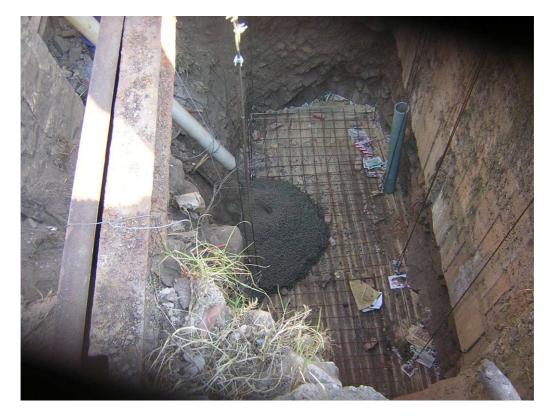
Sacrificial formwork, suspended by steel cables from steel girders, prior to the casting of the primary slab
